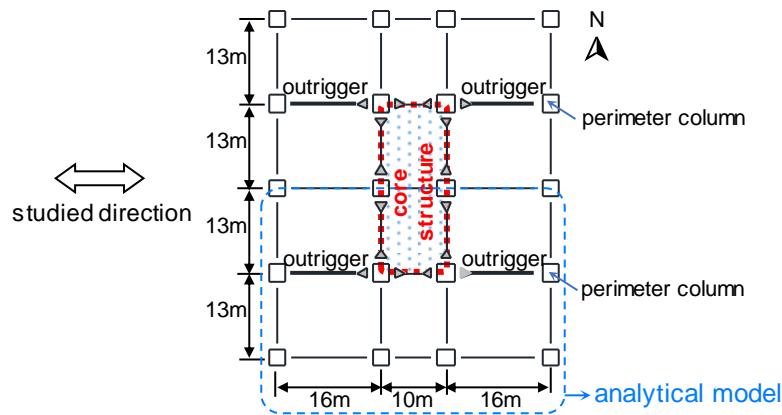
Structural framing plan of BRB-outrigger layer for numerical models
